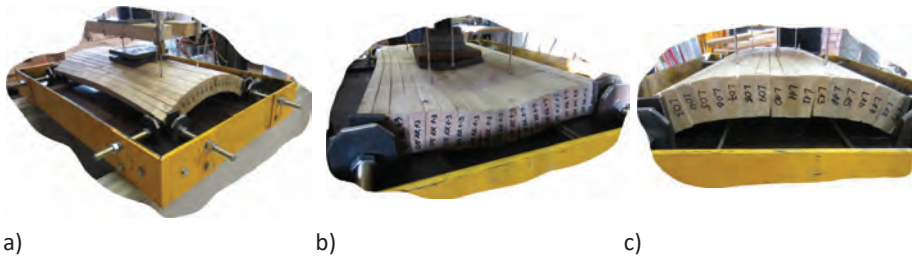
Pre-stressed laminated timber bridge deck (Specimen 05):
